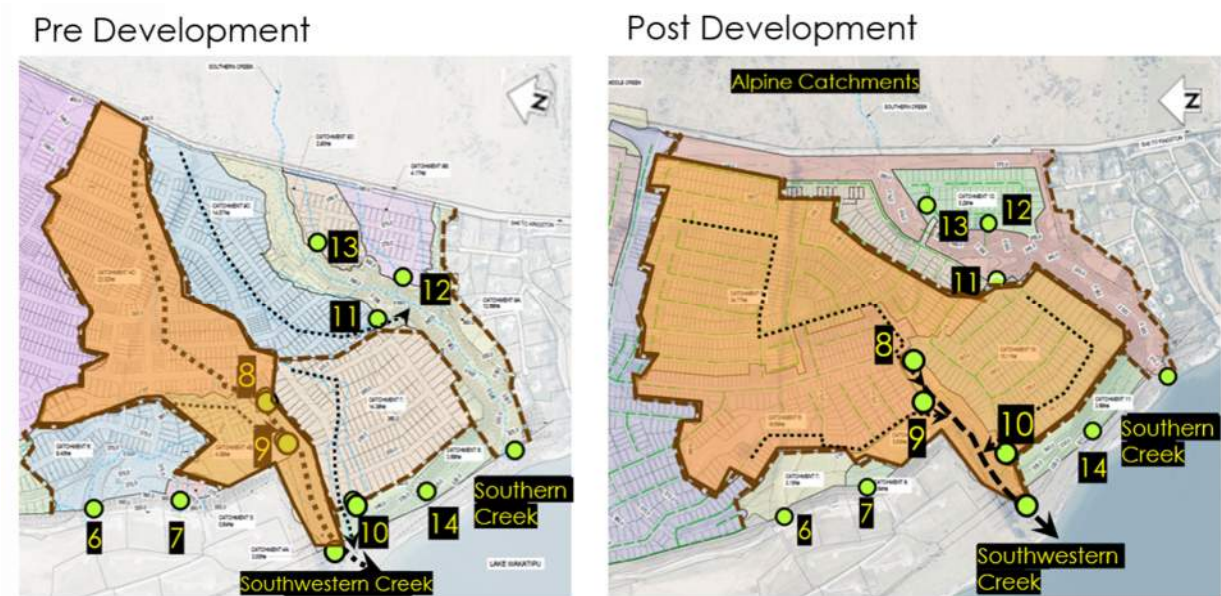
Southwestern Outlets 8, 9, 10 showing flood discharge Catchments Draining to Lake Wakatipu.
